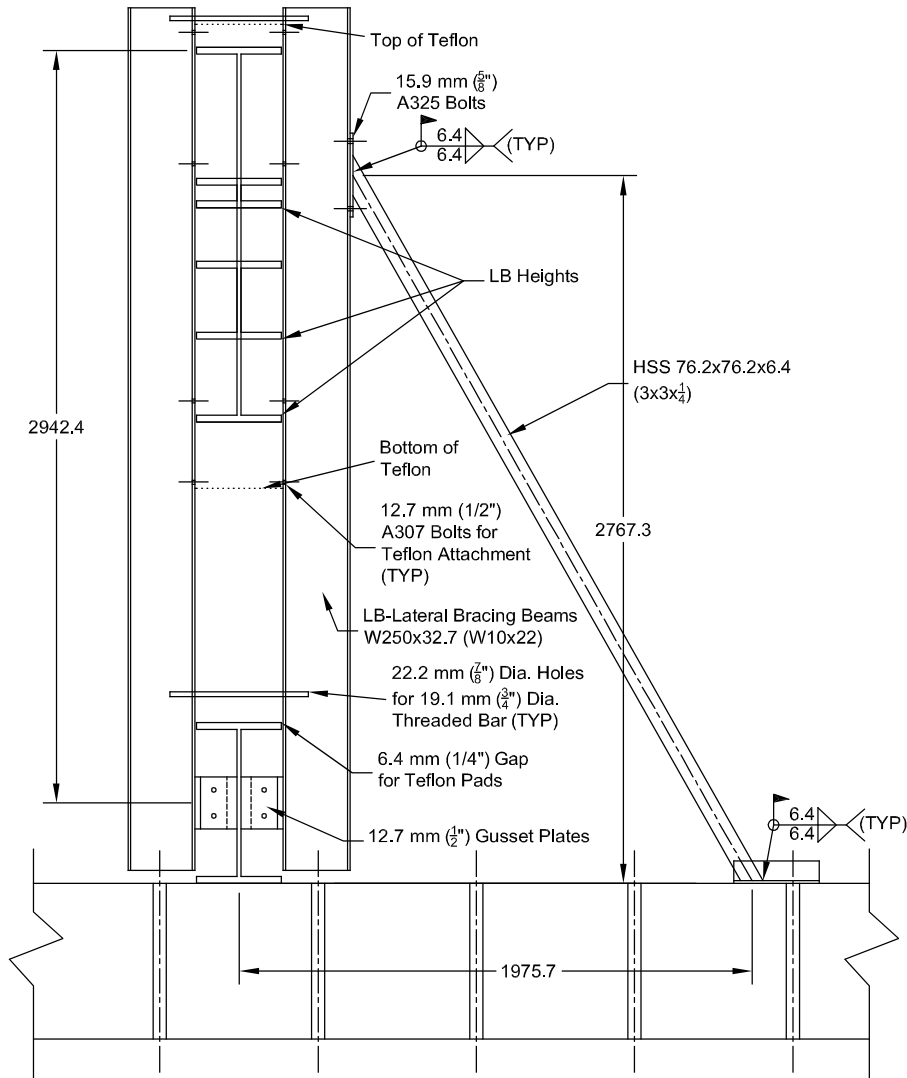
Cross-Section of Setup at Loading Beam Lateral Bracing
